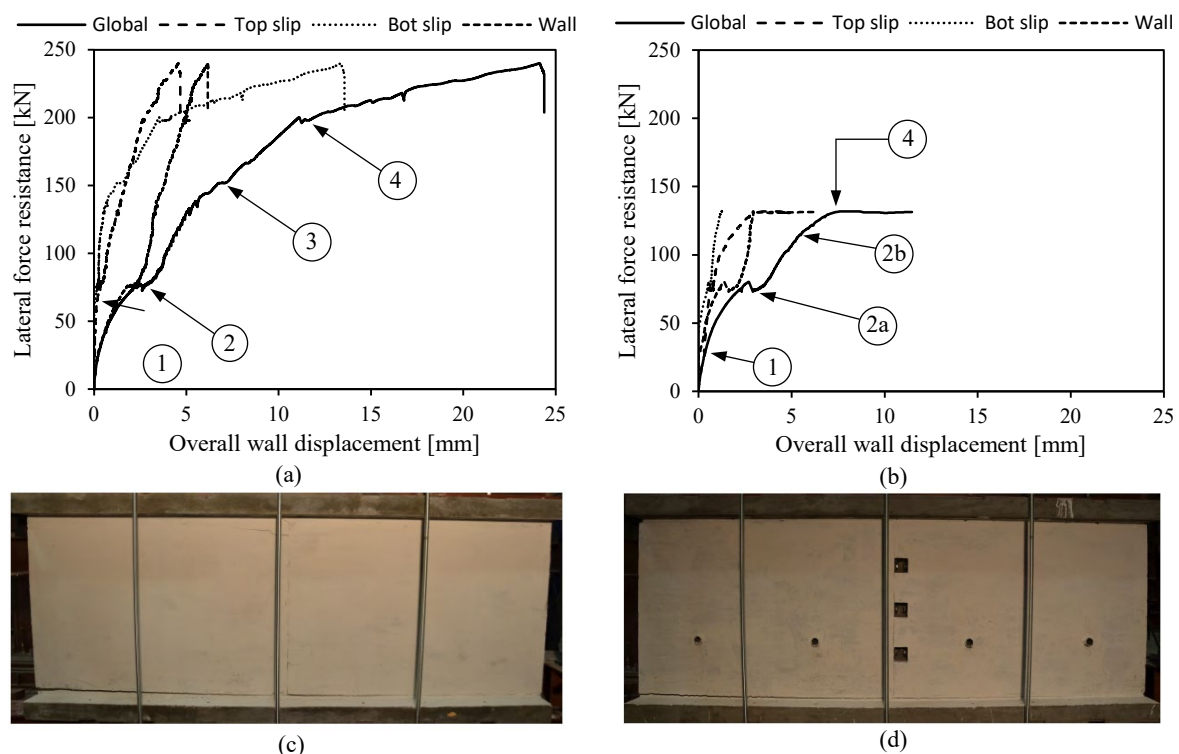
Pull-over test (a) Wall 1 six horizontal connections, and, (b) Wall 3 four horizontal connections, and showing (c) individual panel rotation of Wall 1, and (d) two panel rotation as a unit Wall 3 (Dunn, van Zijl, and van Rooyen (2018))
